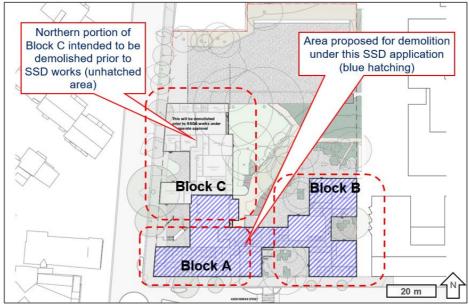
| Demolition plan (Source: Applicant's EIS 2020)
